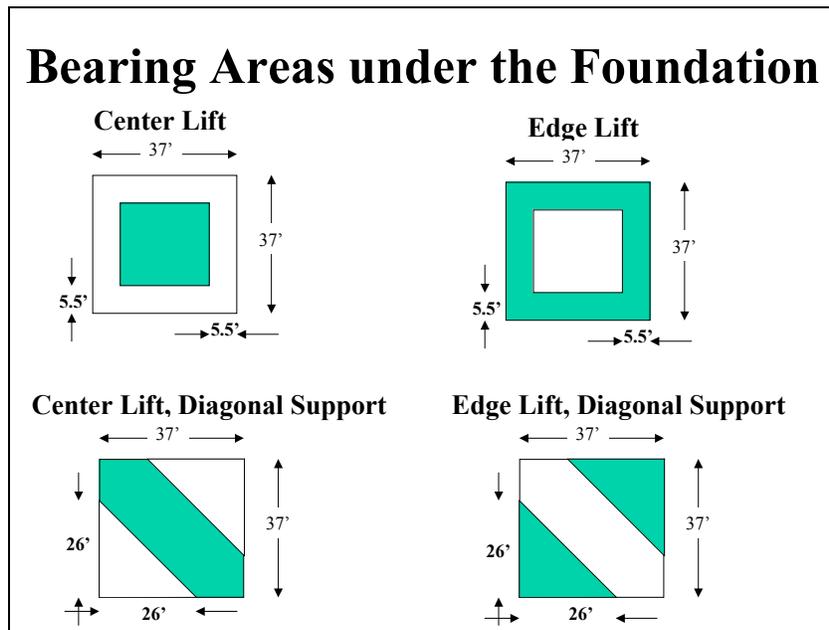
Soil Support Conditions (Shaded portion indicates soil support)
